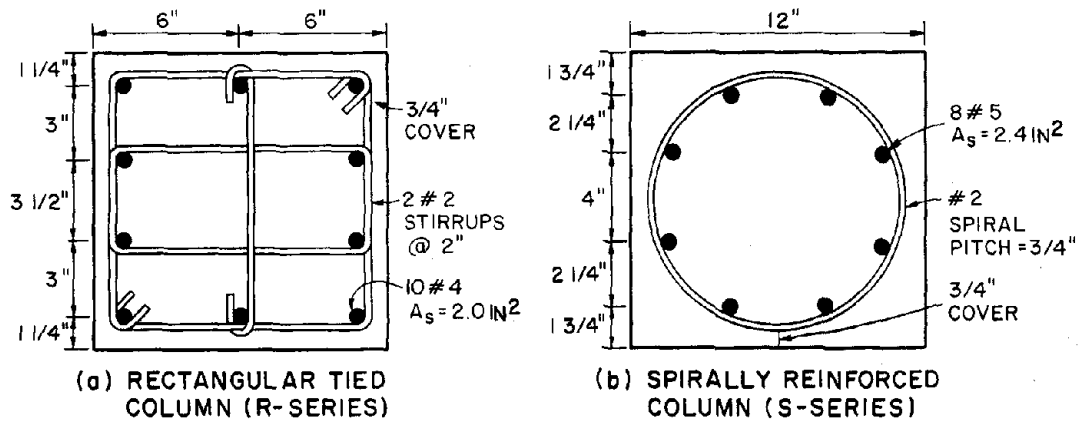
MODEL COLUMN CROSS SECTIONS (1 IN. = 25.4 MM)
